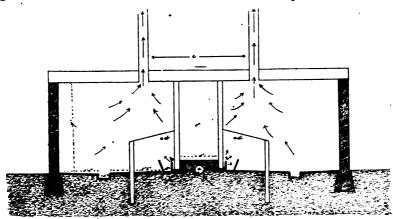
End section of a cattle stable, showing floor, elevated feeding alley and system of ventilation.
